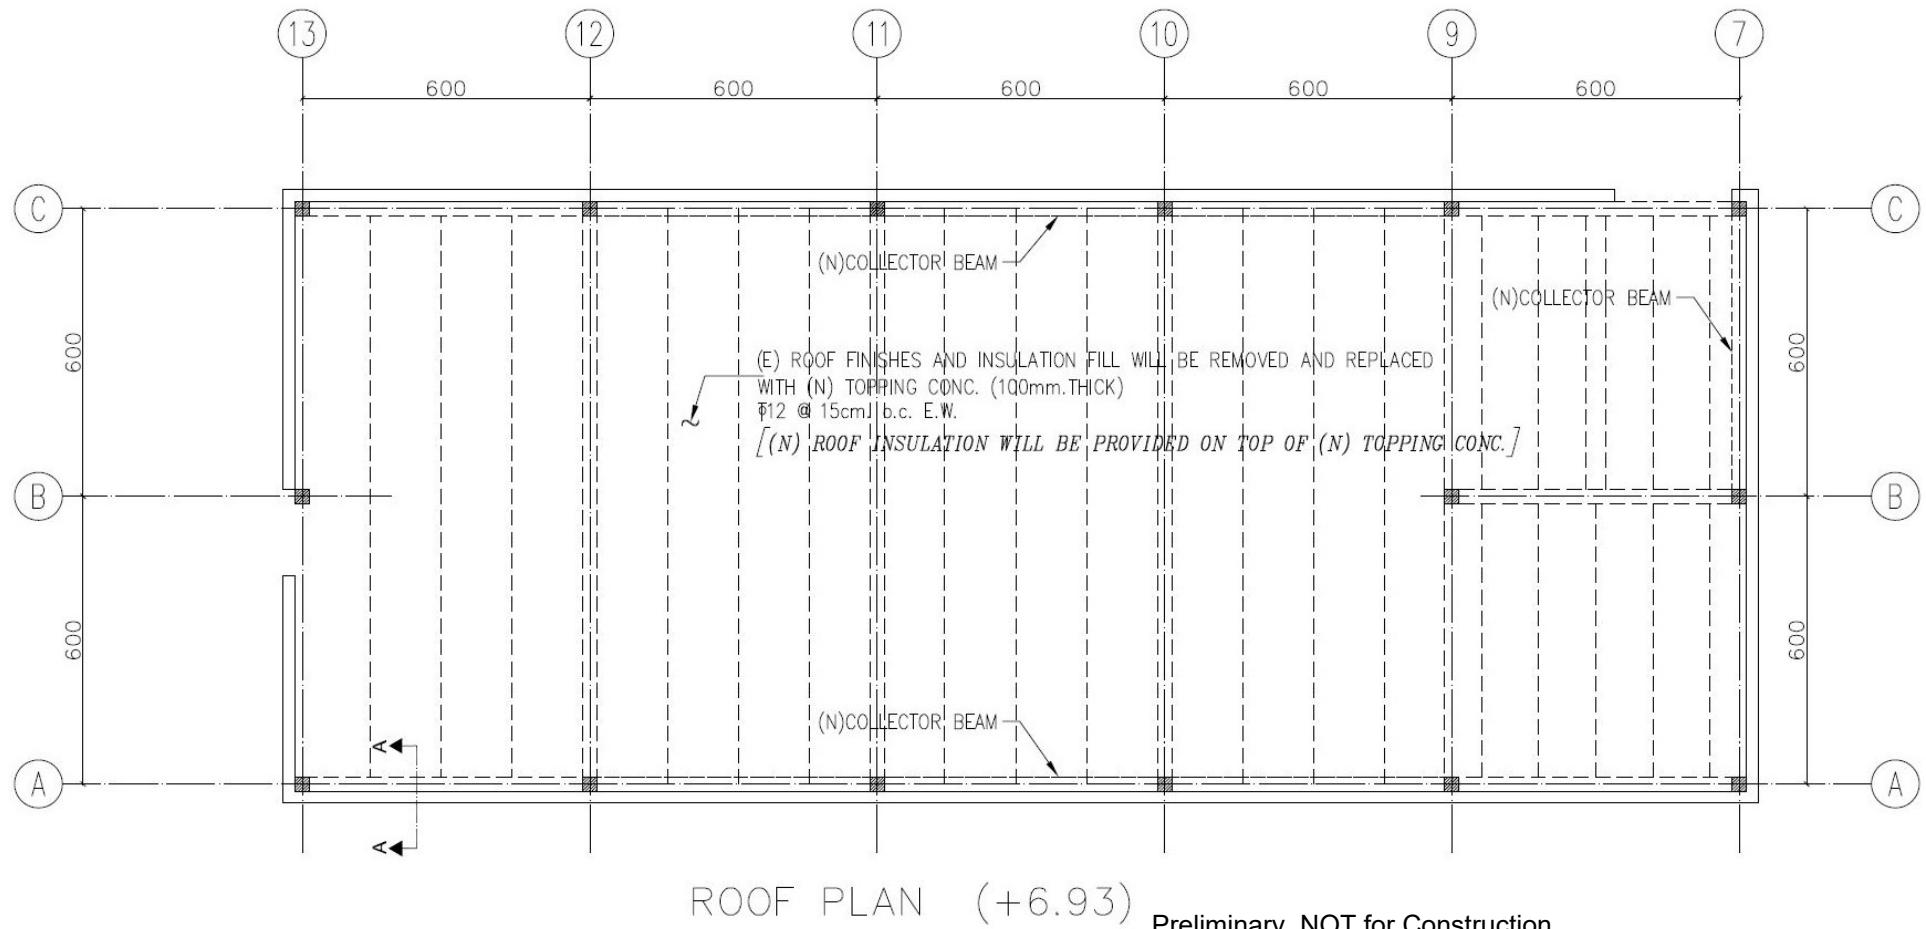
Typology D-1 typical gymnasium - roof plan.
